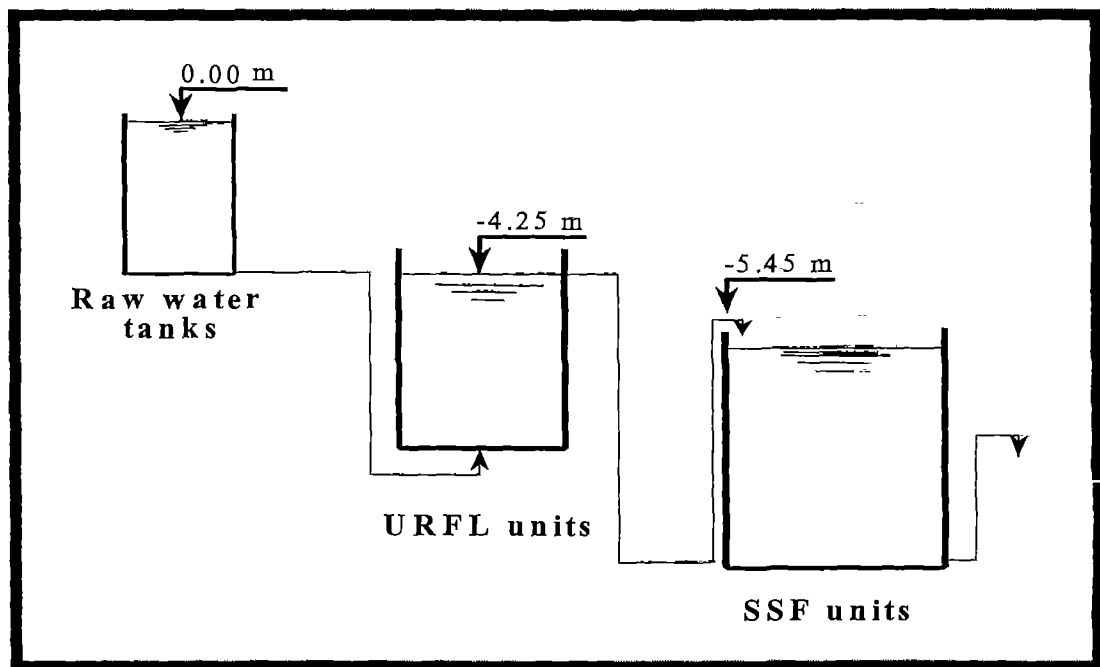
Hydraulic profile of pilot plant *Iolanda
